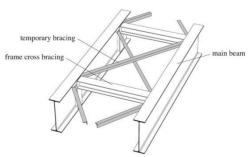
Plan bracing (Lebet, Hirt, 2013)
